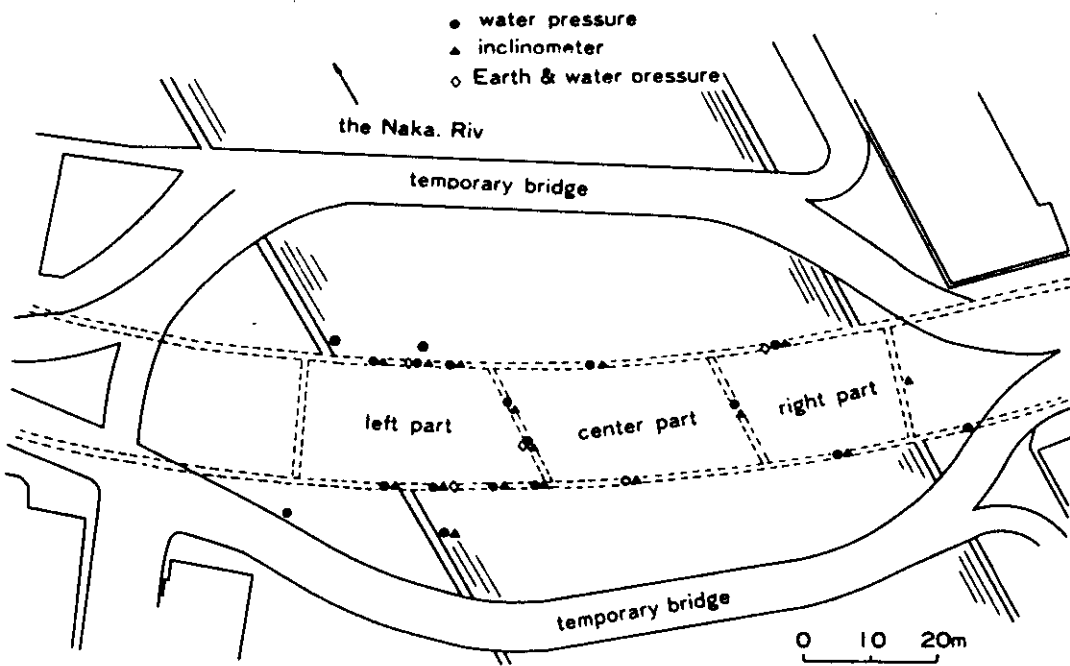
Plan view of excavation site Nakagawa construction section, Fukuoka
